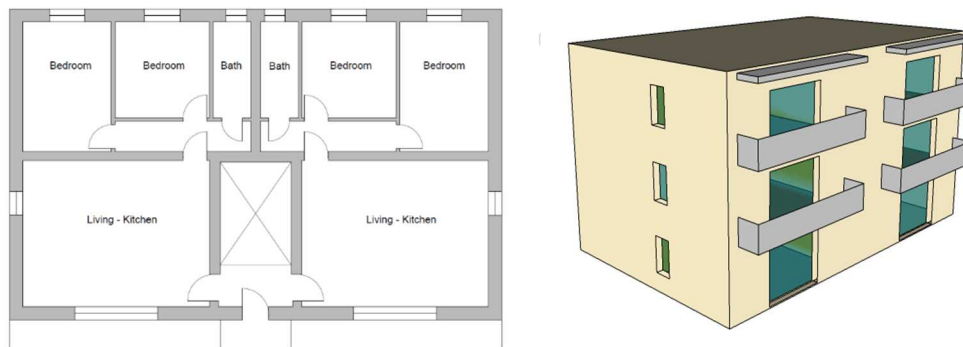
Analyzed building: building plan (1:200) and South-West view.
